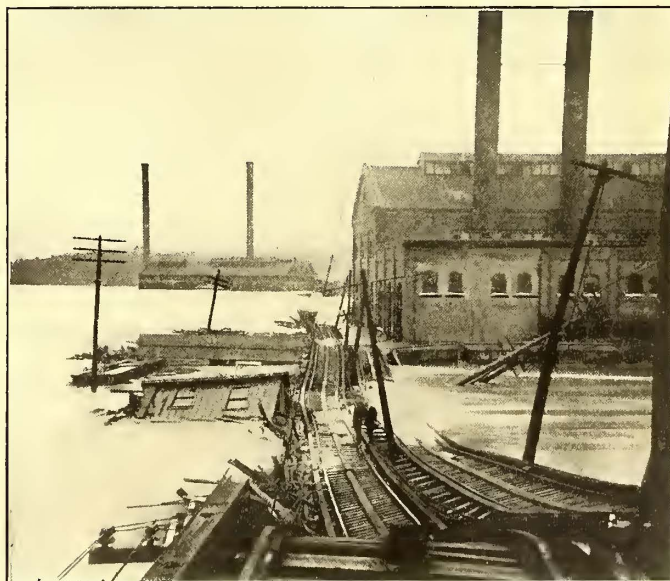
PARTLY SUBMERGED ELECTRIC LIGHT STATION AND WRECKED ELEVATED STRUCTURE, CENTRAL AVENUE POWER STATION IN DISTANCE
